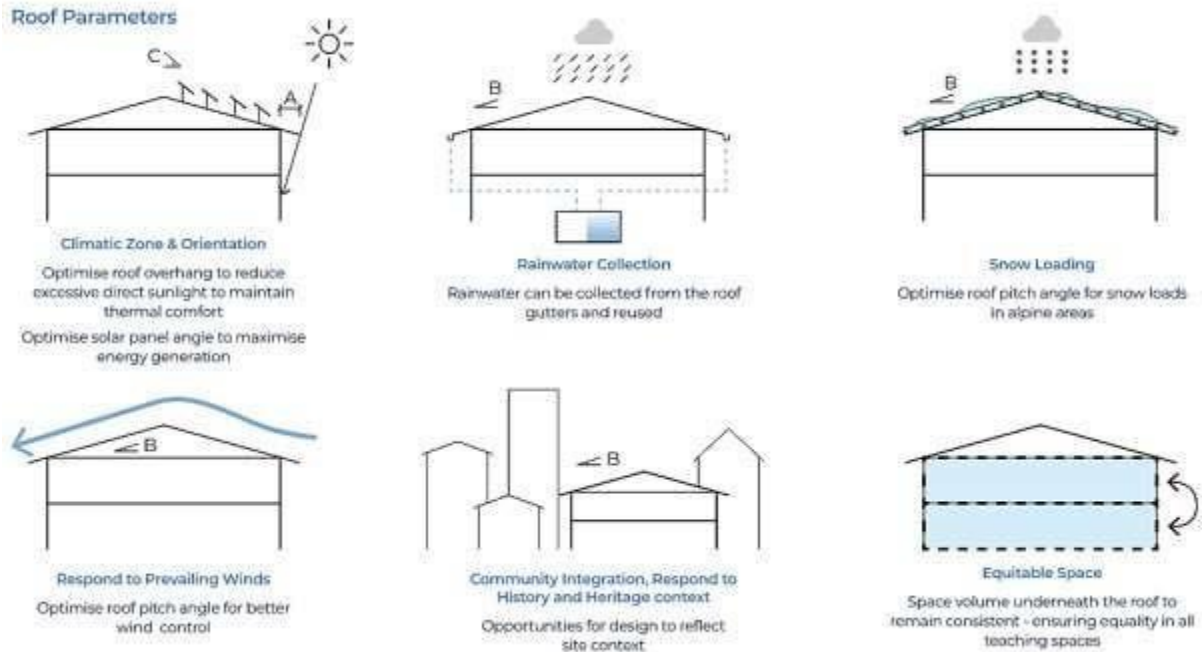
Roof design considerations (Extracted from SINSW DFMA Guideline)
